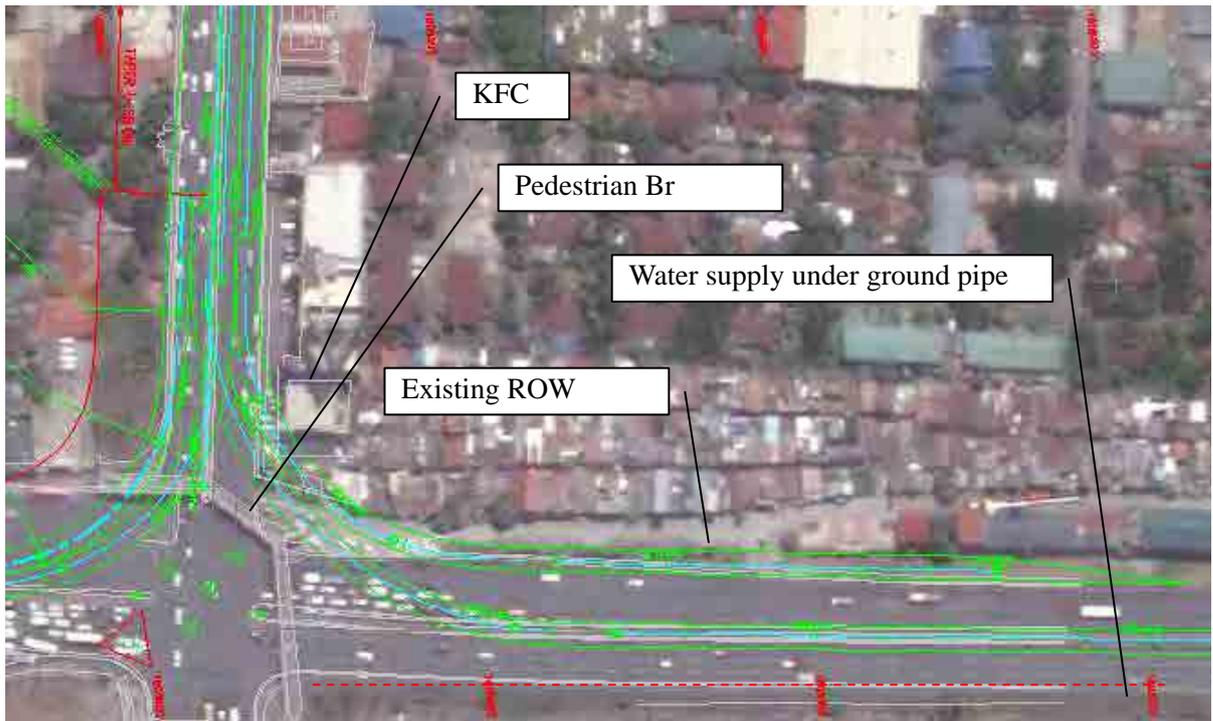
HORIZONTAL CONTROL POINTS OF C AND D RAMP
